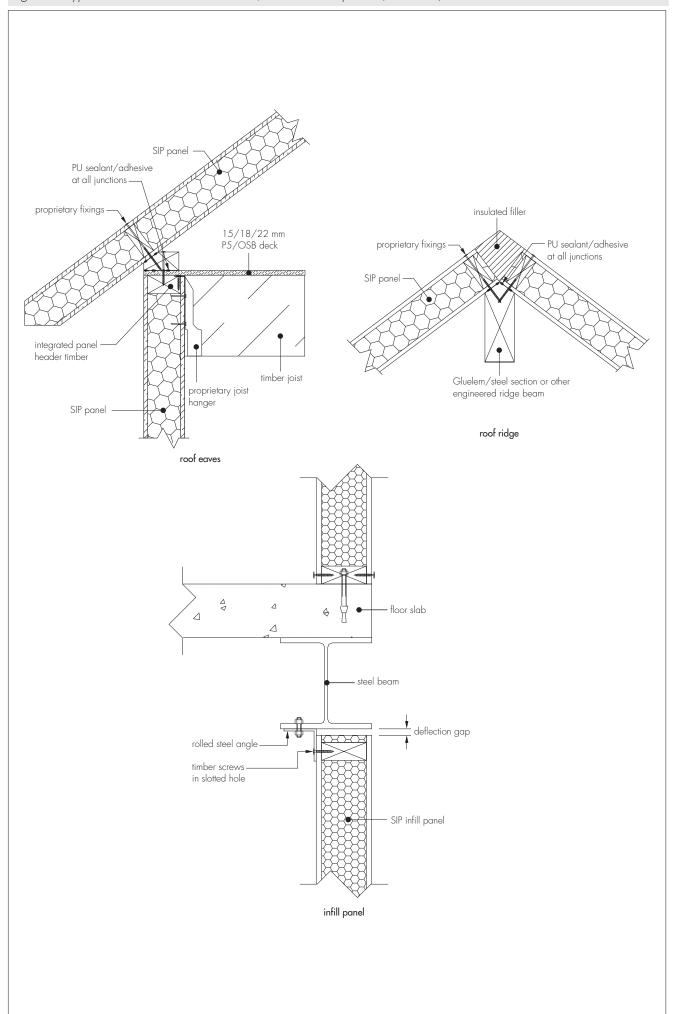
Typical construction details — wall, roof and infill panels (continued)
